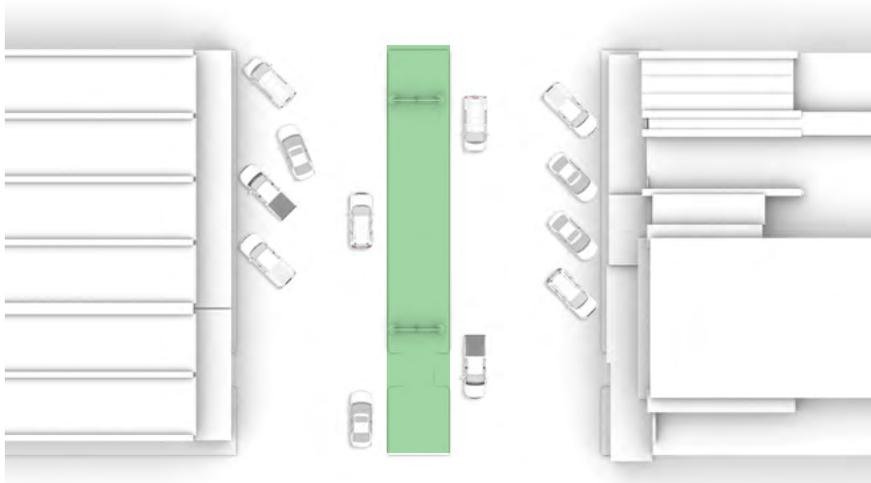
Scenario A Plan - A widened planted median in Firebrace Street
